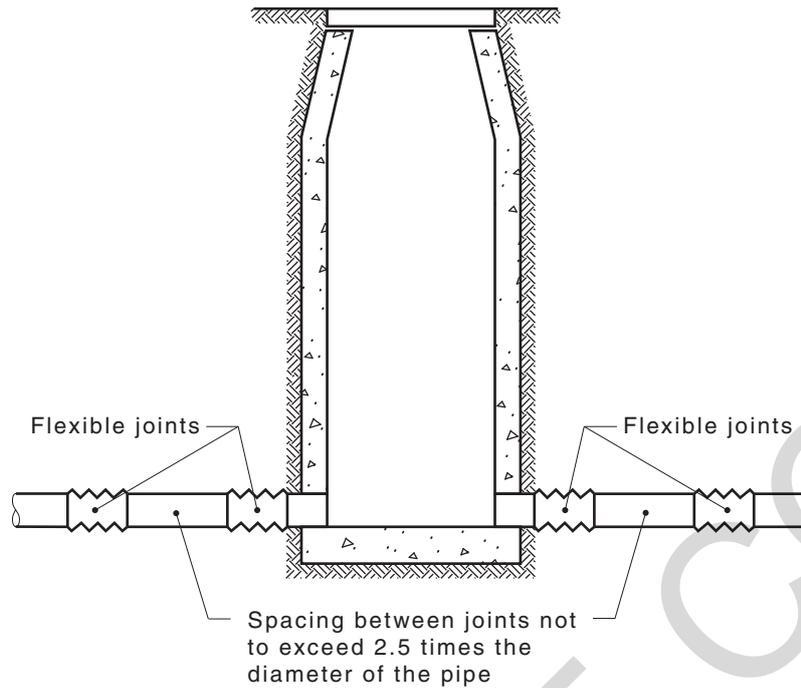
4.8.5 TYPICAL ~~JUMP-UPS AT~~ INSTALLATION OF FLEXIBLE JOINTS INSTALLED IN INSPECTION CHAMBERS OR SIMILAR STRUCTURES
